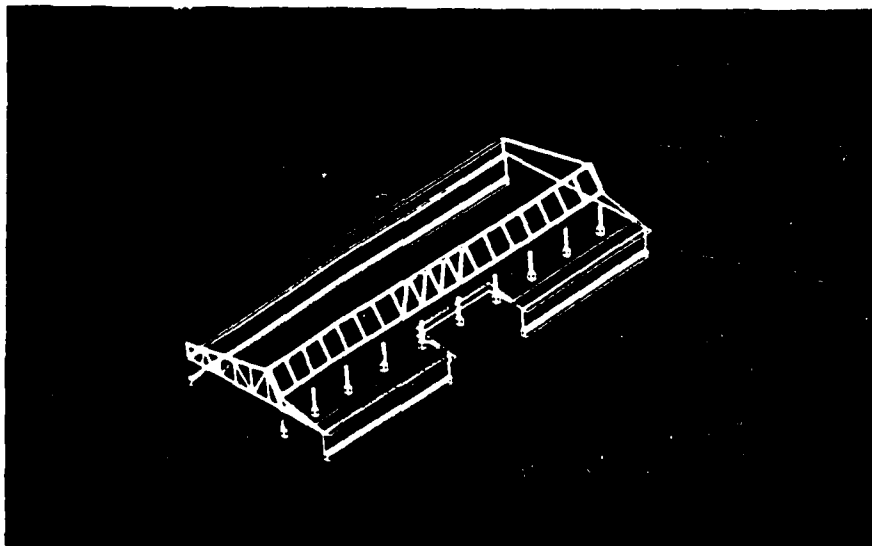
Conflicts in placement of components can be detected, e.g., the girder and roof.
